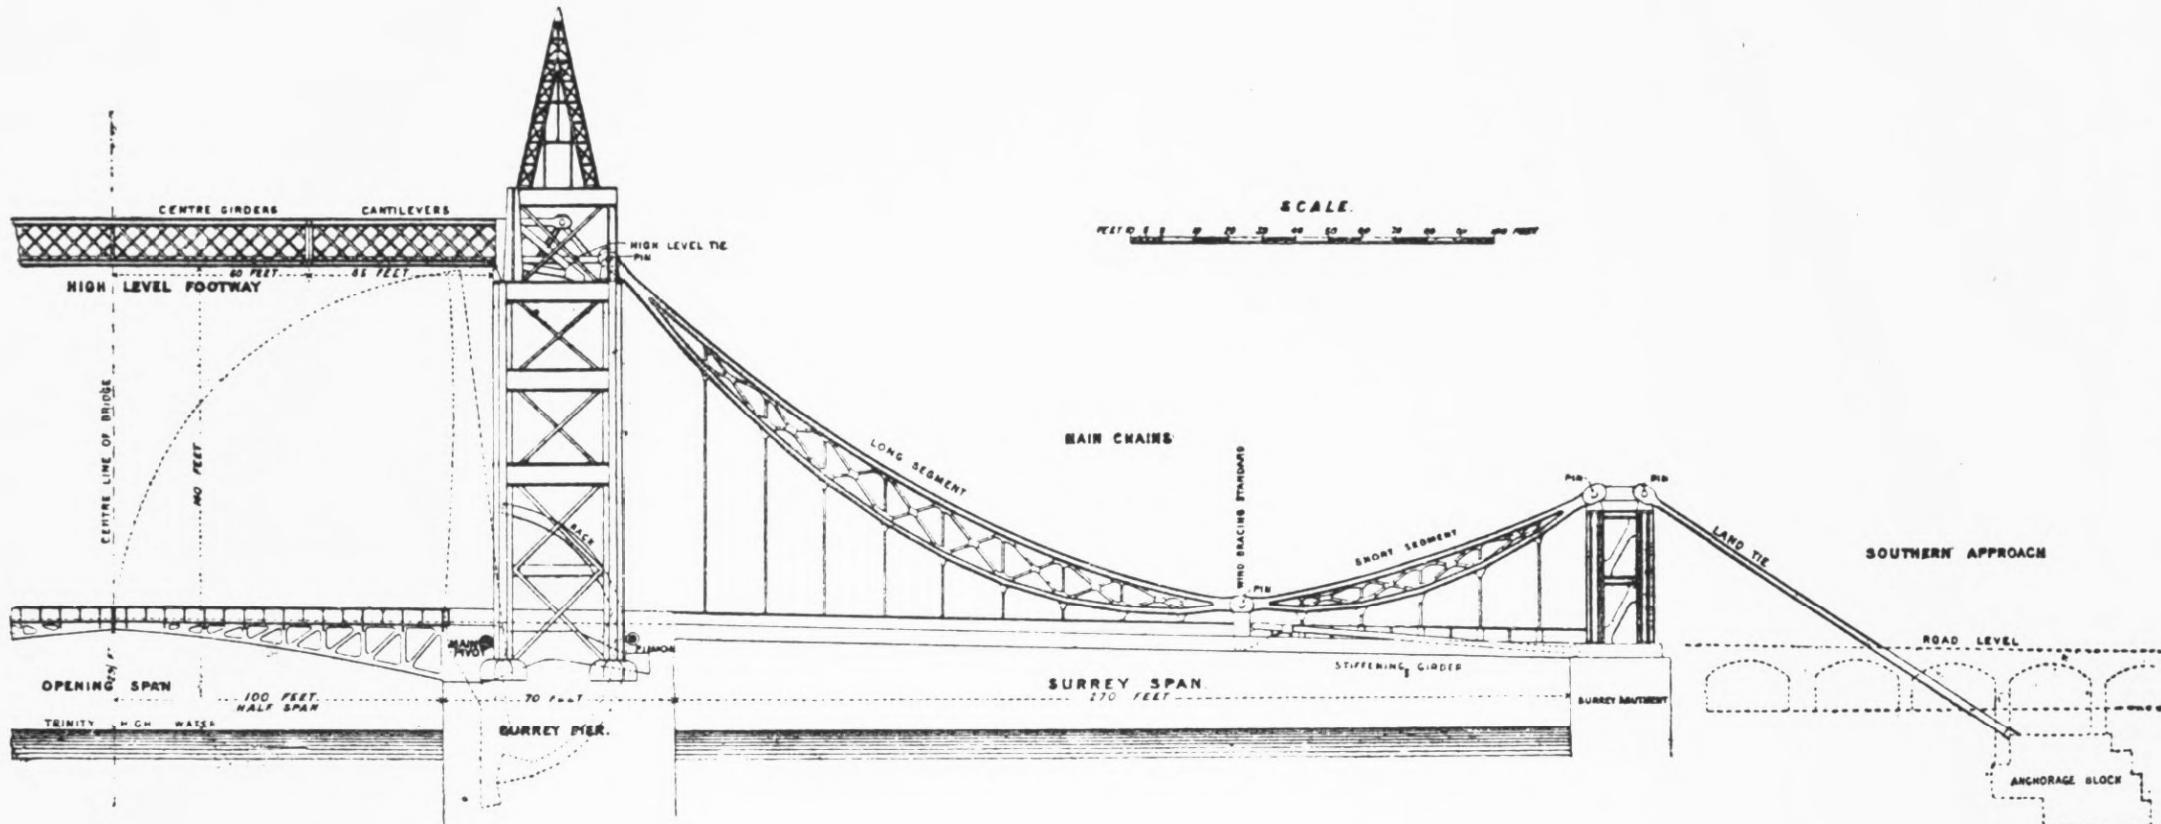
FIG. X. SKELETON HALF ELEVATION OF TOWER BRIDGE.
